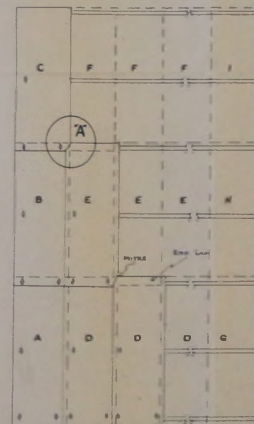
DETAILS OF SHEETS TO BE CUT ON HIPS. ROOFS MARKED "E"
